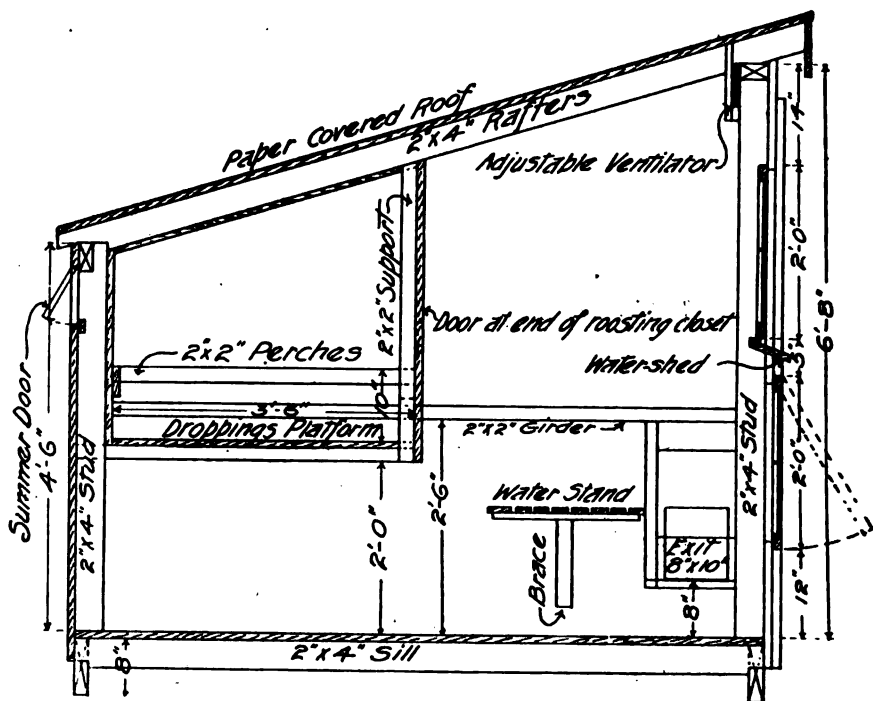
A cross-section plan of the Cornell breed-testing house. Note the construction of the windows, water-shed, and ventilating doors in the back and front walls
